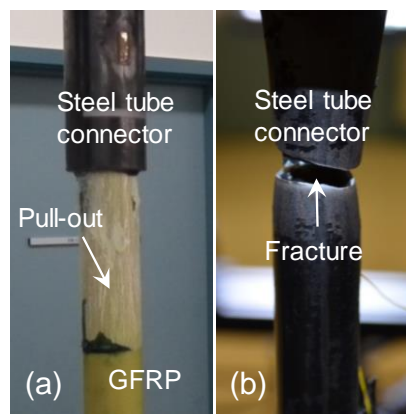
Typical failure modes of bonded sleeve connection specimens: (a) pull-out failure; (b) fracture of steel tube connector.
